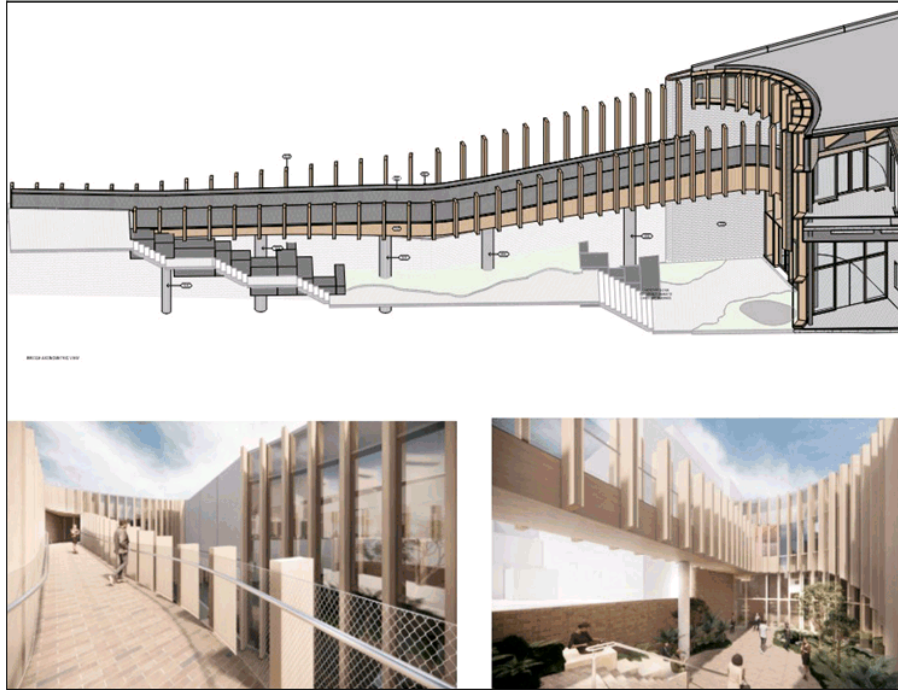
Axonometric View and Photo-Renders of proposed pedestrian bridge.
